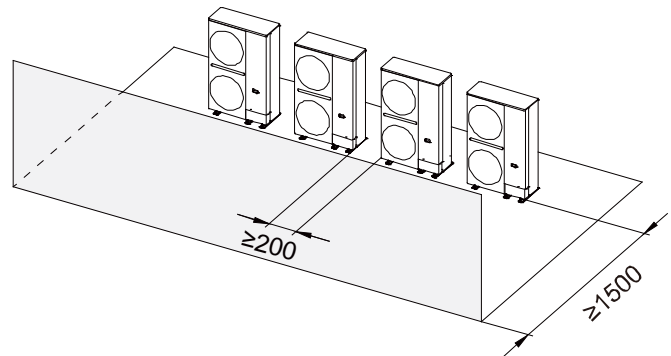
More than one outdoor unit installation (unit: mm)
